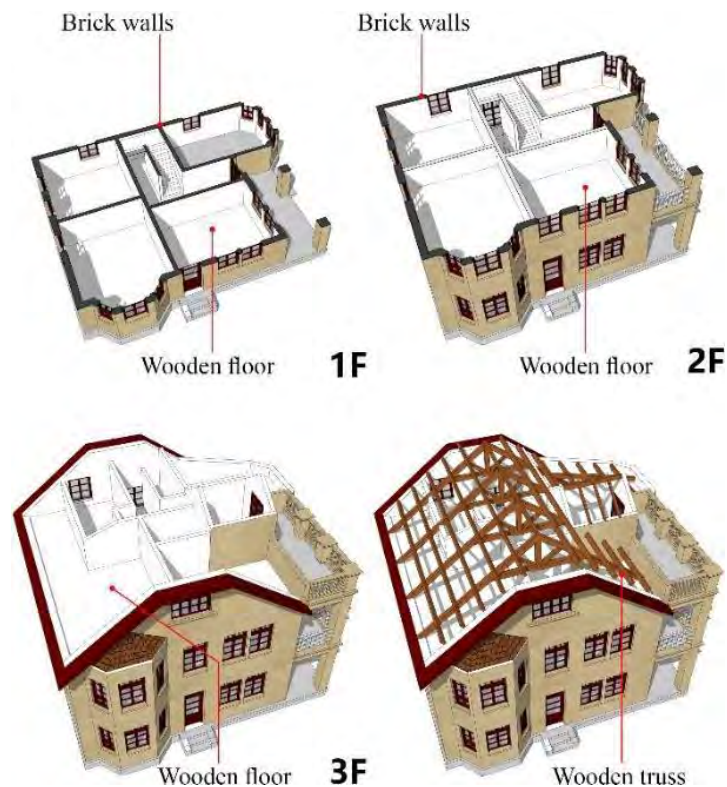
Brick-and-wood structure of building No.2 (Image source: drawn by the author)
